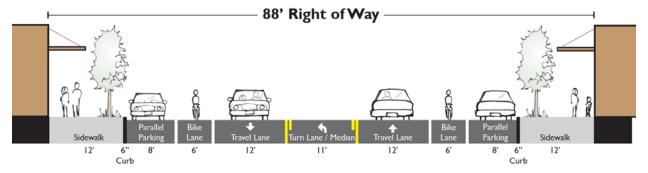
Sidney Road SW – Storefront Road Section. This road section corresponds with the section of Sidney Road SW designated as a storefront street in Figure 13.
